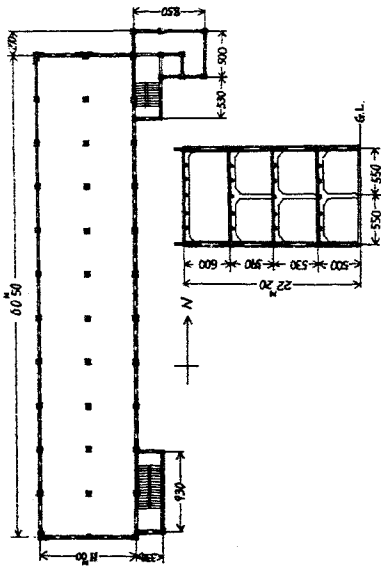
Plan and section of a four-storied reinforced concrete building.
